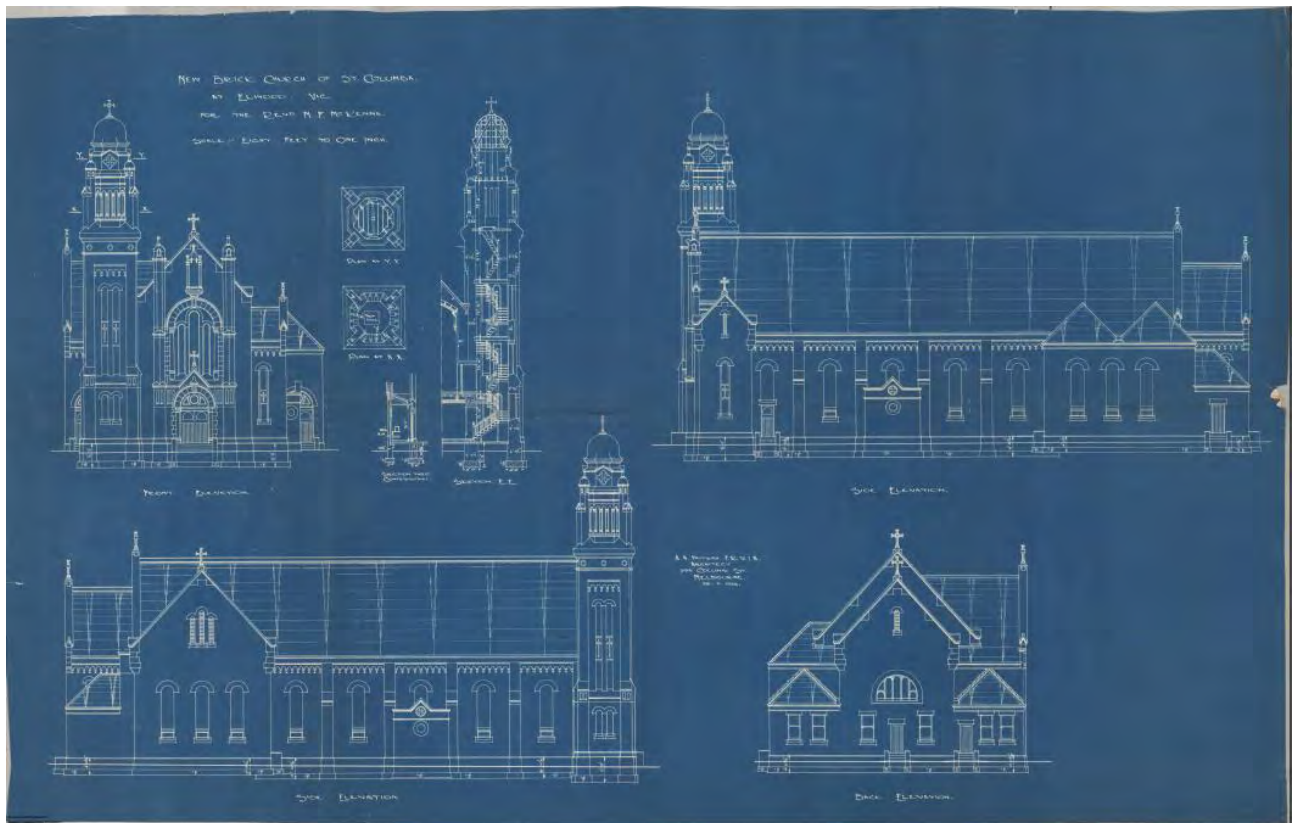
New brick church of St. Columba's at Elwood, Vic., for the Rev M. F. McKenna (section and elevations). Source: A. A. Fritsch. 1928. Drawings of 26 Glen Huntly Road, Elwood. Council Records. City of Port Phillip.
